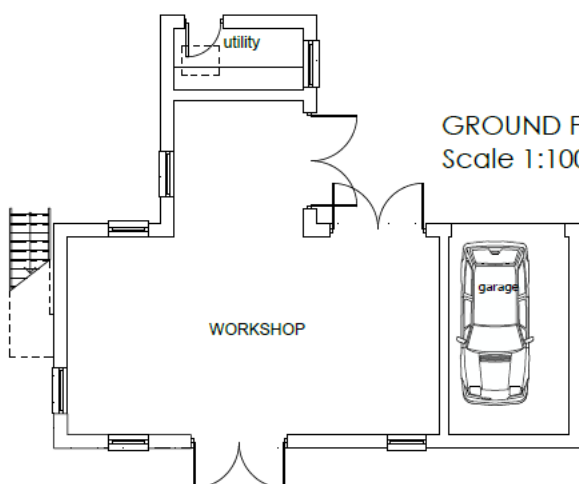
Existing Holiday Let Floorplans [Source: Lisa Allard MCIAT]
